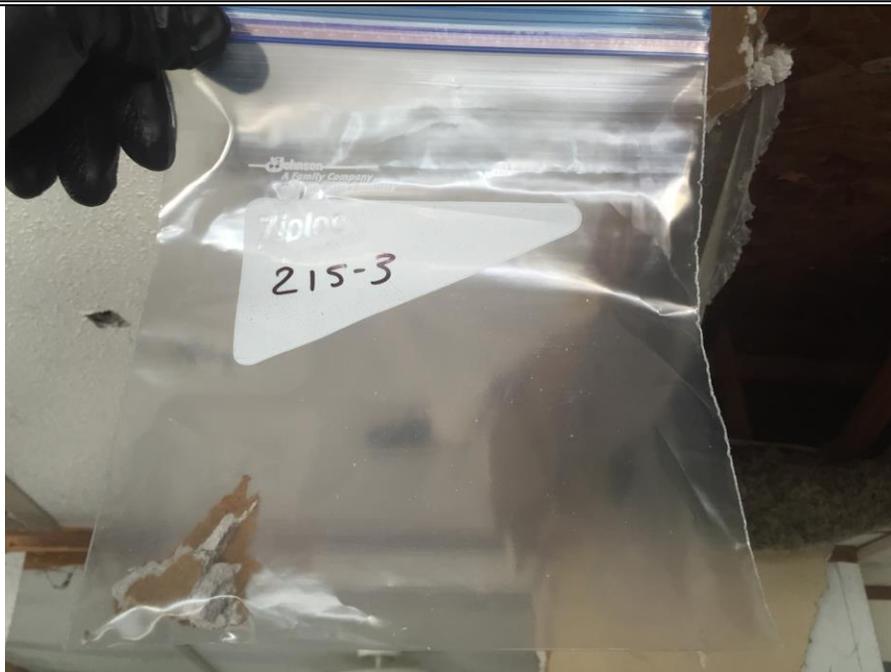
VIEW OF SAMPLED CEILING PANEL.
